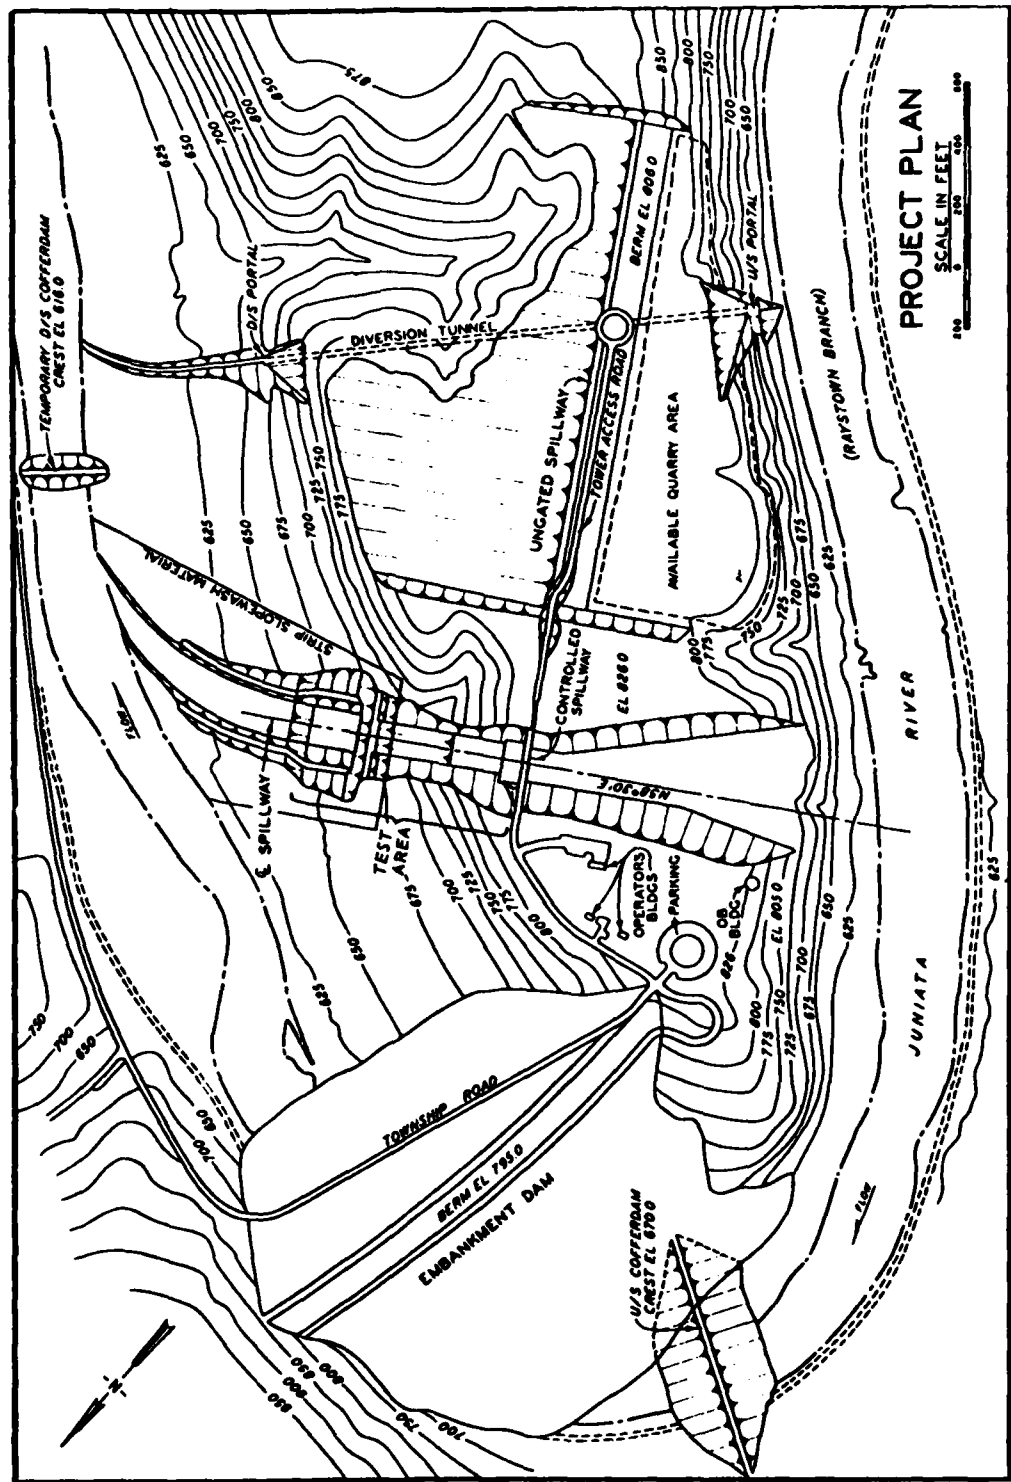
Site plan, Raystown Dam (from Fagerburg, 1979)
